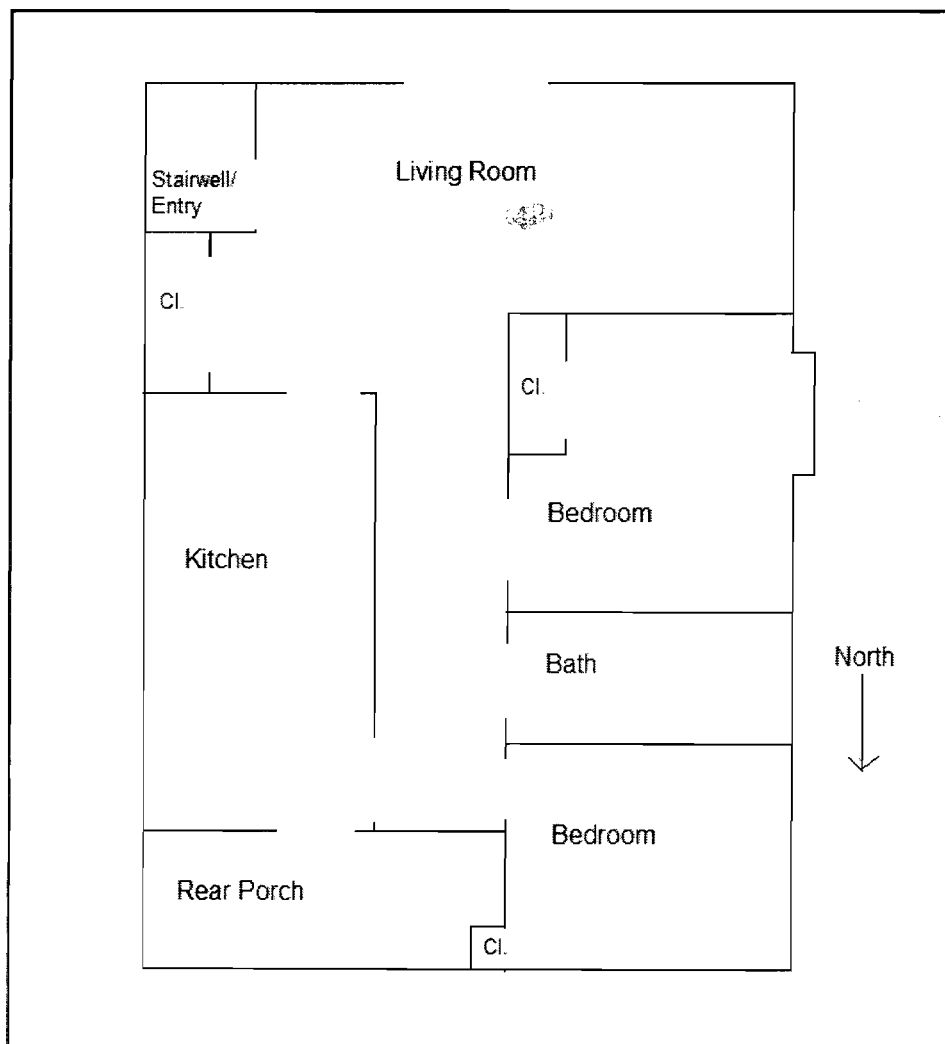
Floor plan for second-story west flat in 1312-14 E. 27th Street—not to scale.
